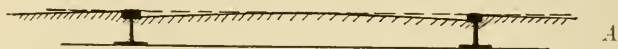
When bituminous paving must be used between T-rails the pavement should start from beneath the rail heads.
